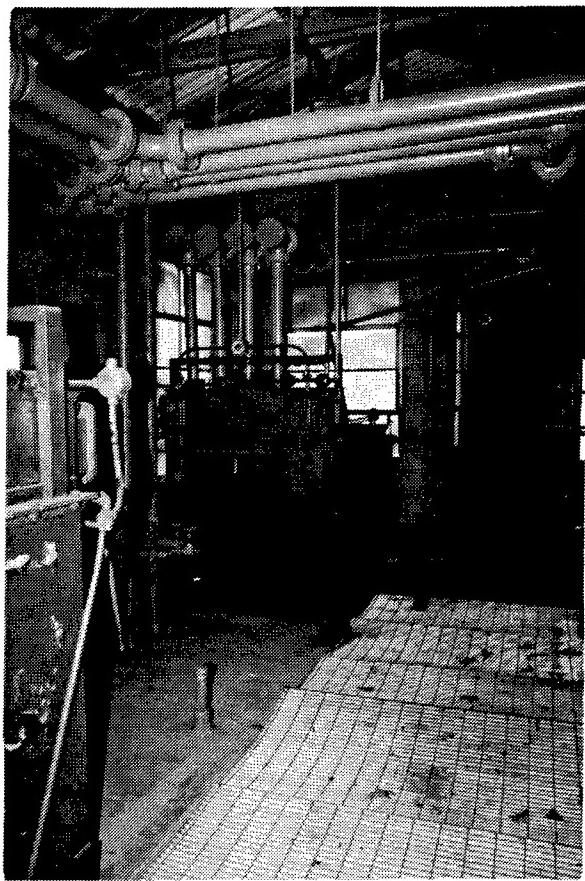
Building CB-4: Interior view of this Melt Pour Building.
